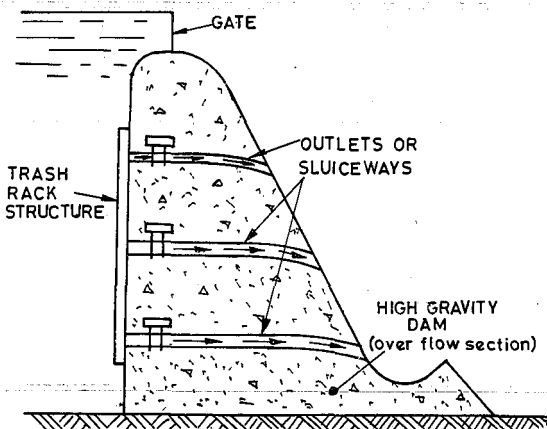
Typical outlet arrangements through a concrete gravity dam.
